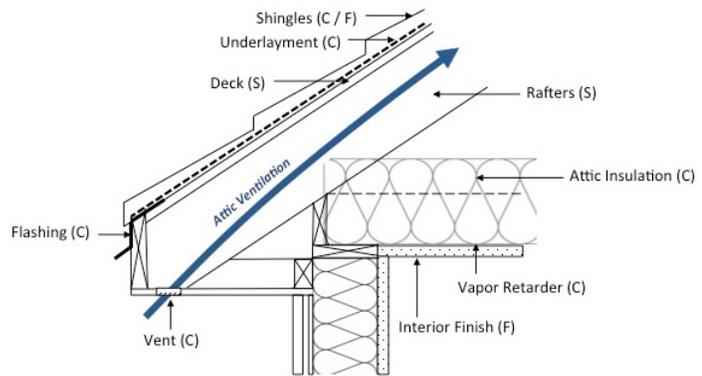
Example of a sloped roof demonstrating control, support, and finish functions
